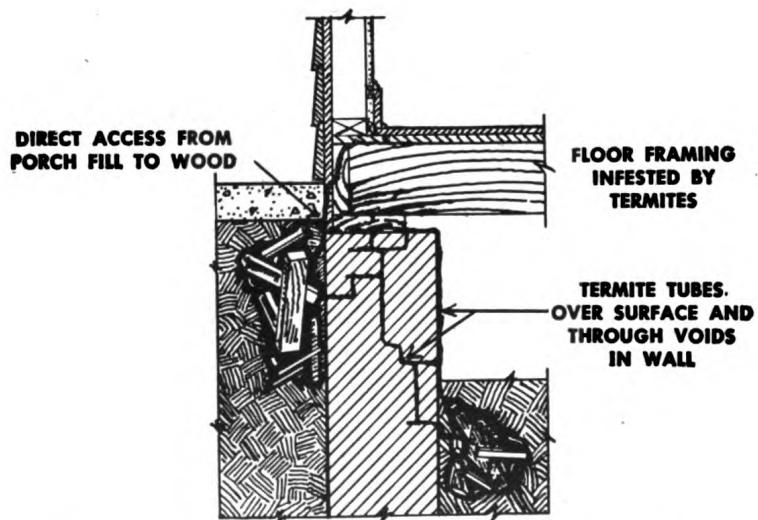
Wood buried in the soil about the foundation provides termite harborage.
